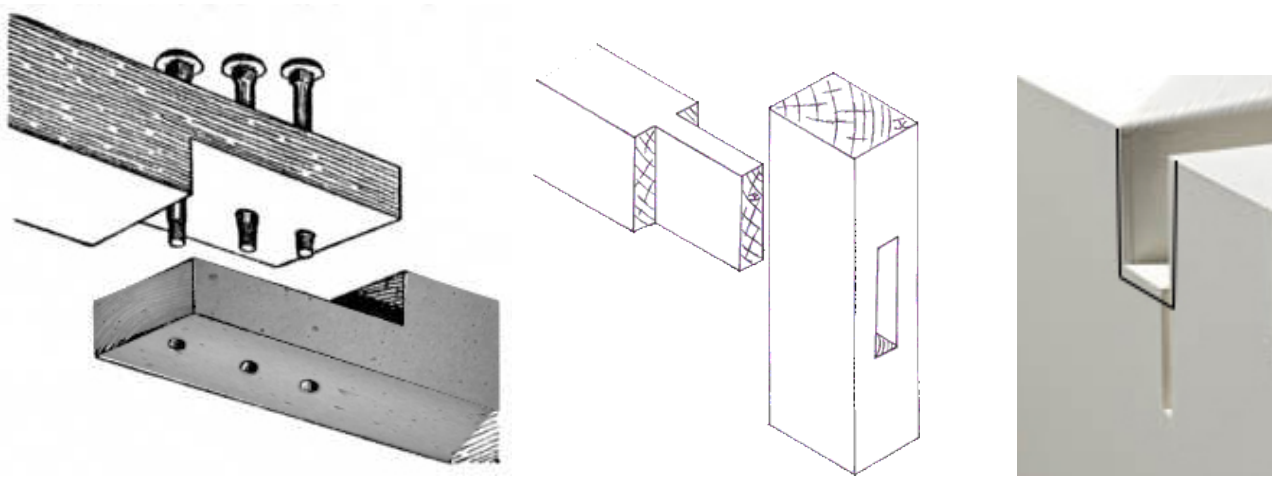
Possible concrete / timber connections for extensions off starter core house. Far right, Concrete Notch
